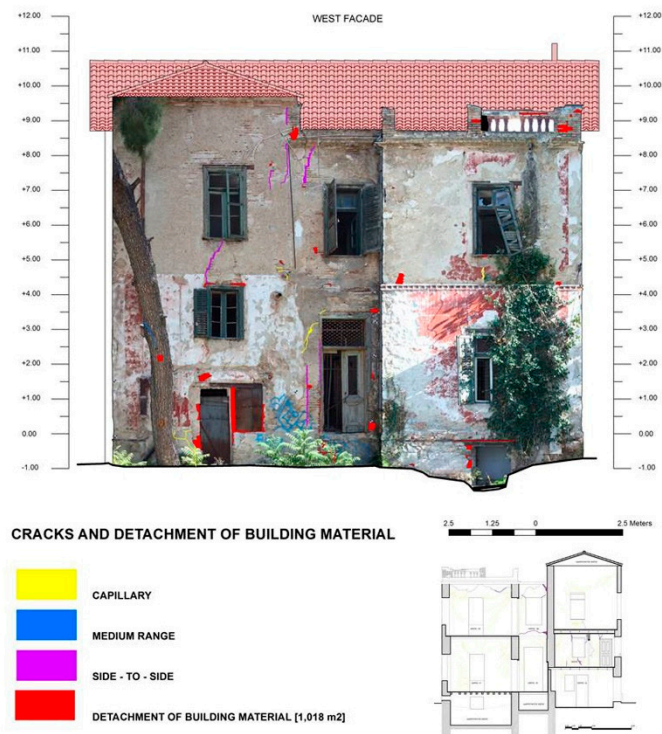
Thematic map of cracks and detachment of building materials depicted on the west façade of the building.
